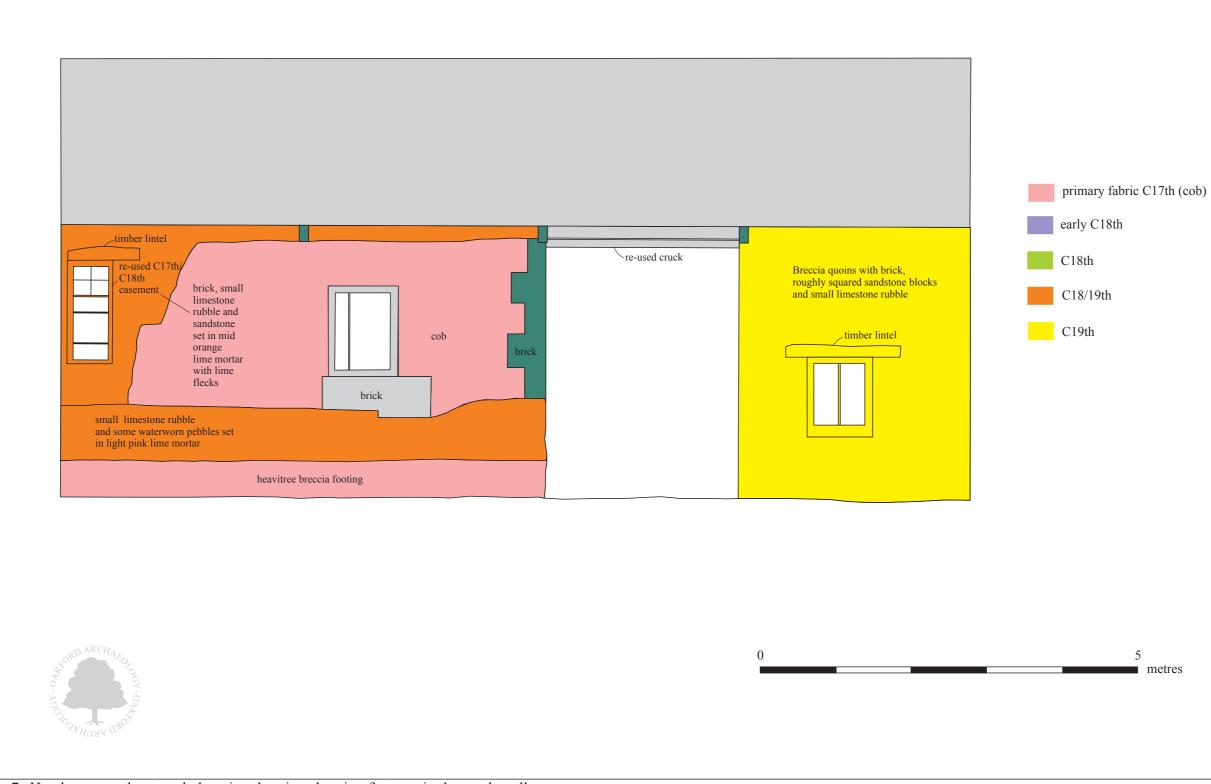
Hand-measured external elevation drawing showing features in the north wall.
